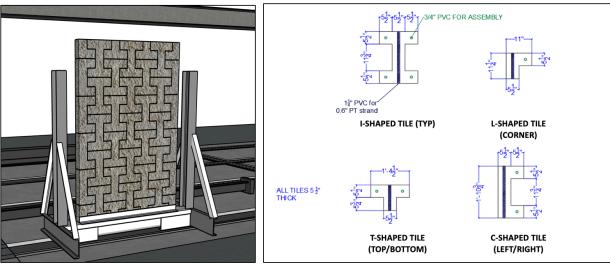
3D model of TeSA wall specimen (left); Individual tile dimensions (right).
